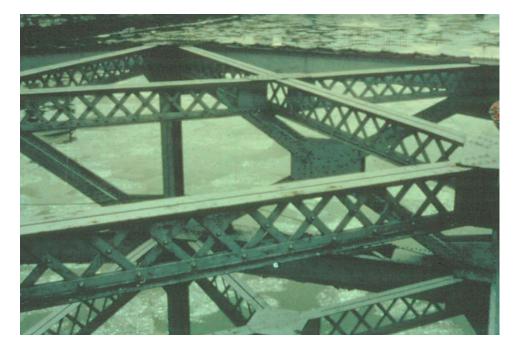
Bracing Members Made from Angles, Bars, and Plates
